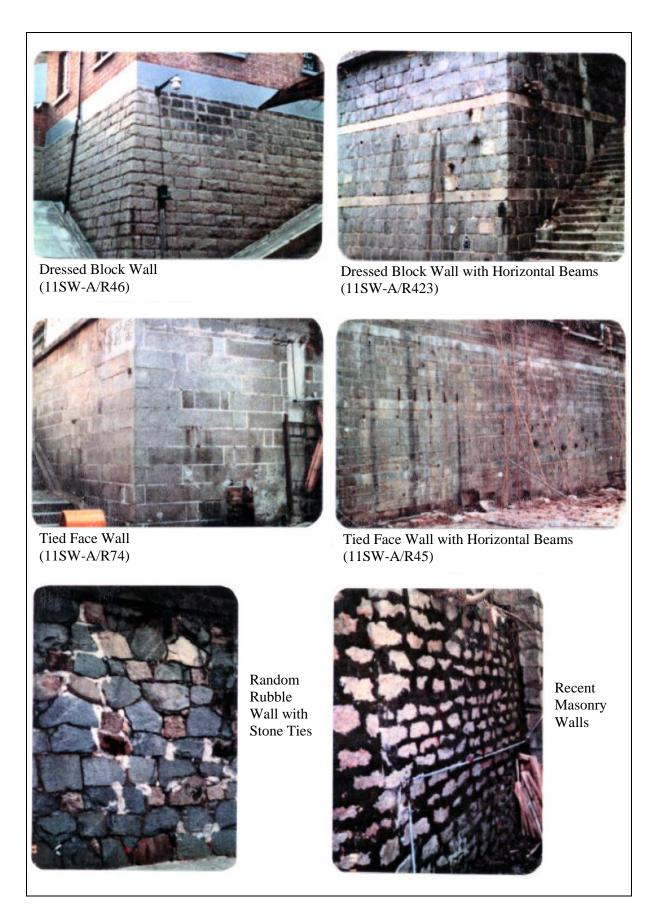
Common Types of Masonry Walls and Masonry Facings (Sheet 2 of 3)
